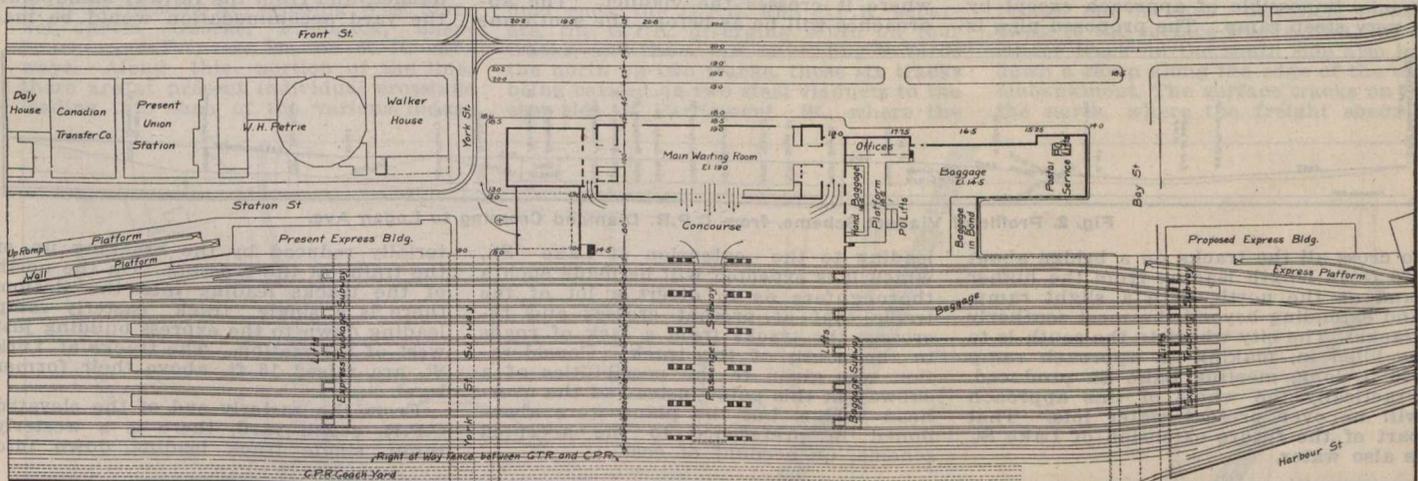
Plan of New Union Station, showing the Trackage, and Passenger and Baggage Facilities.
